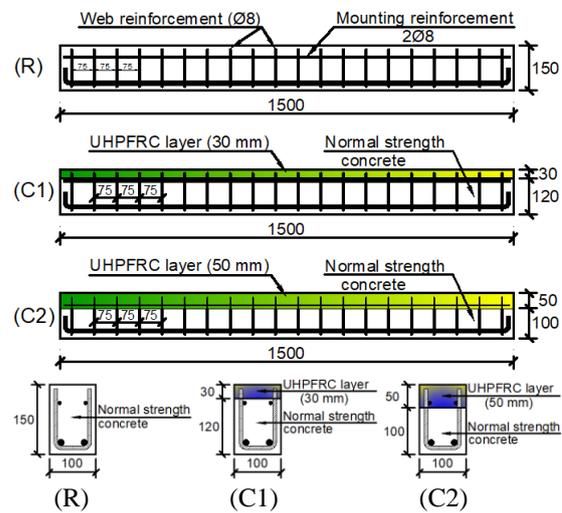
Details of the modeled composite beams (all dimensions are in mm)
